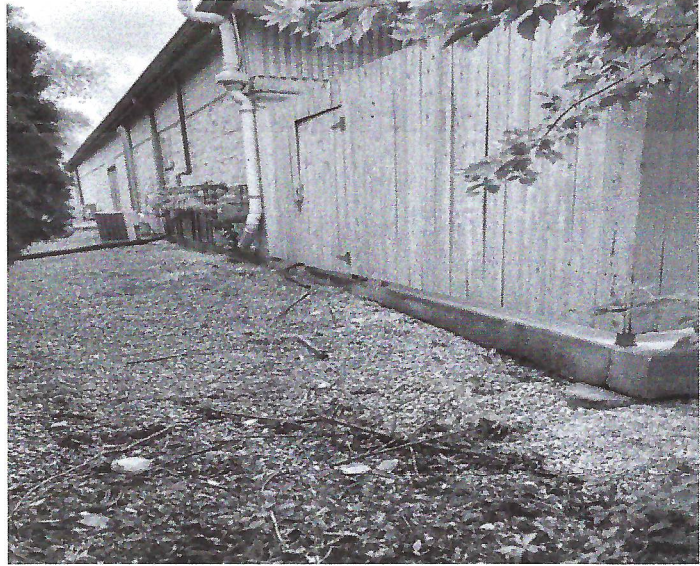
Looking west at the Southeast corner of building at 13855 W. North Ave. all soil shown to be covered by existing dumpster/generator concrete slab and gravel landscaping.
